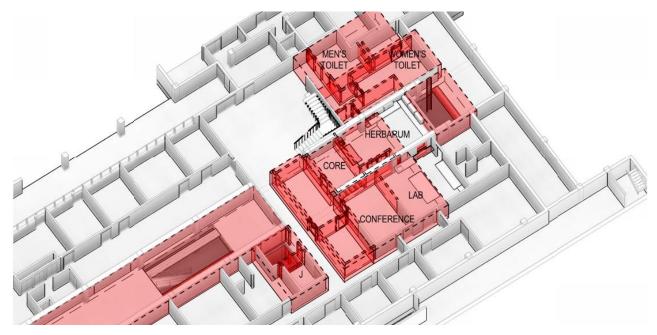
Phasing Diagram Demo Floor Plan, Level 1
